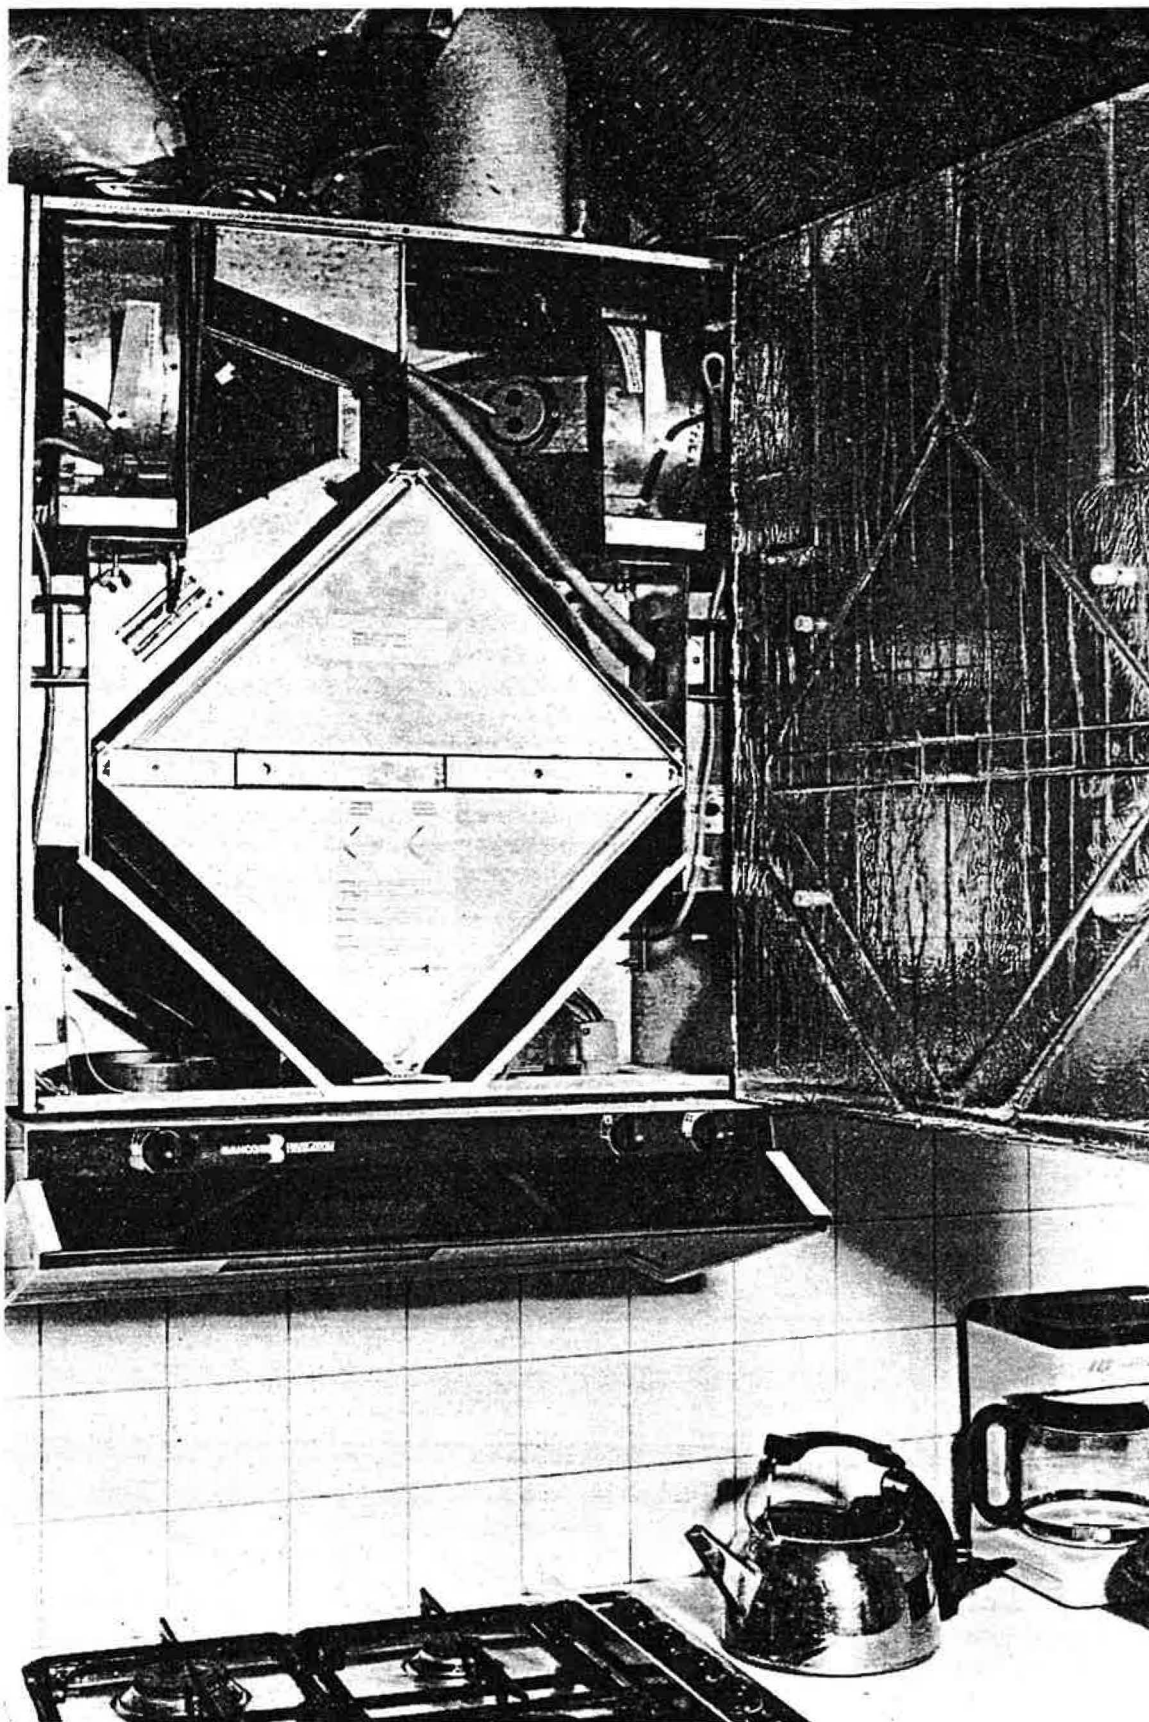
BAHCO Ventilation Unit Installed In Demonstration House Kitchen
